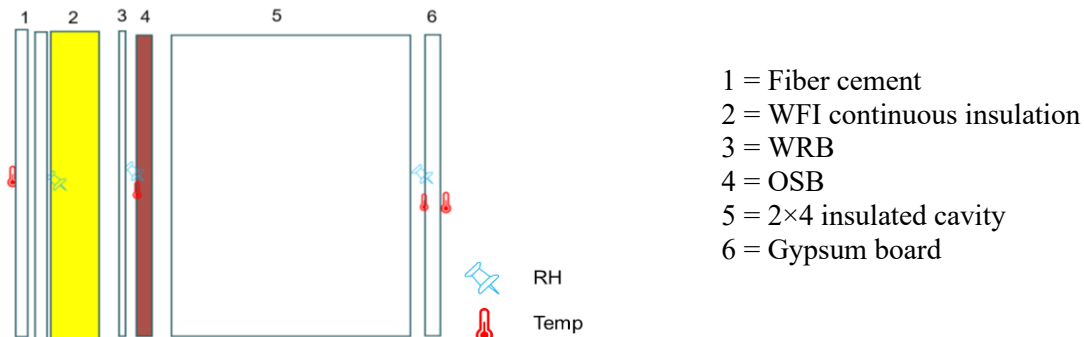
The retrofit wall panel layout for a wall without a vapor barrier.
